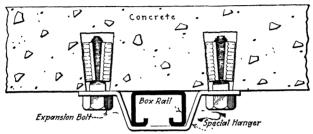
Showing method of attaching box rail to existing concrete slab.
